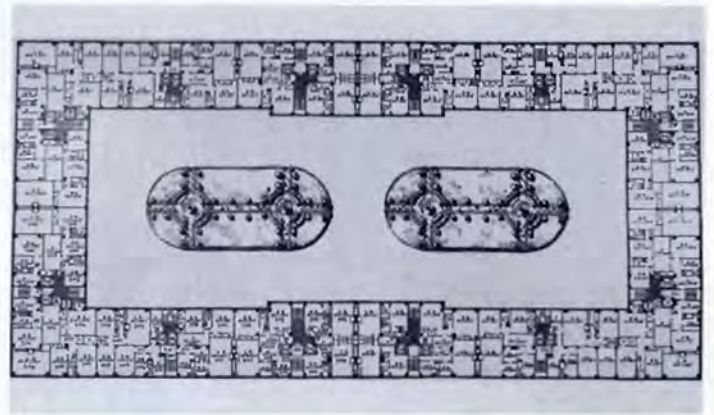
277 Park Avenue. McKim, Mead & White. 1925. Plan of typical floor.
